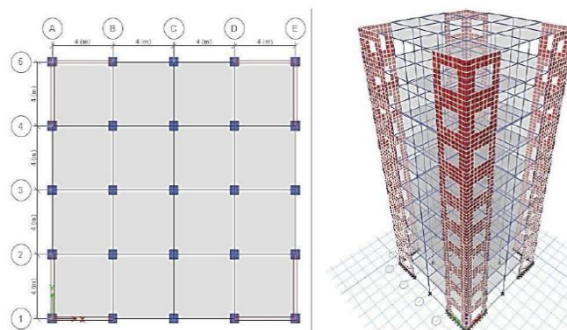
Shear wall structure plan and 3D model with a vertical aperture of 2 m by 1.75 m.
